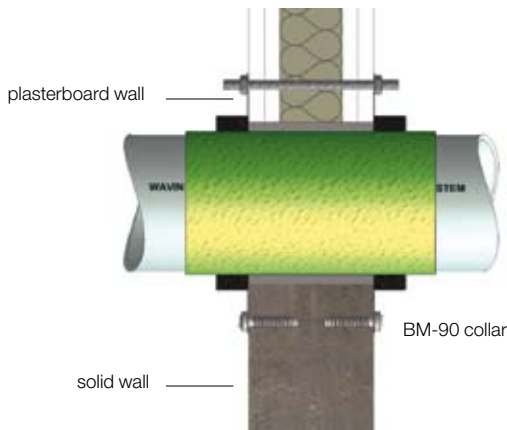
BM-90 fire collar: seal with sleeve for wall installation
